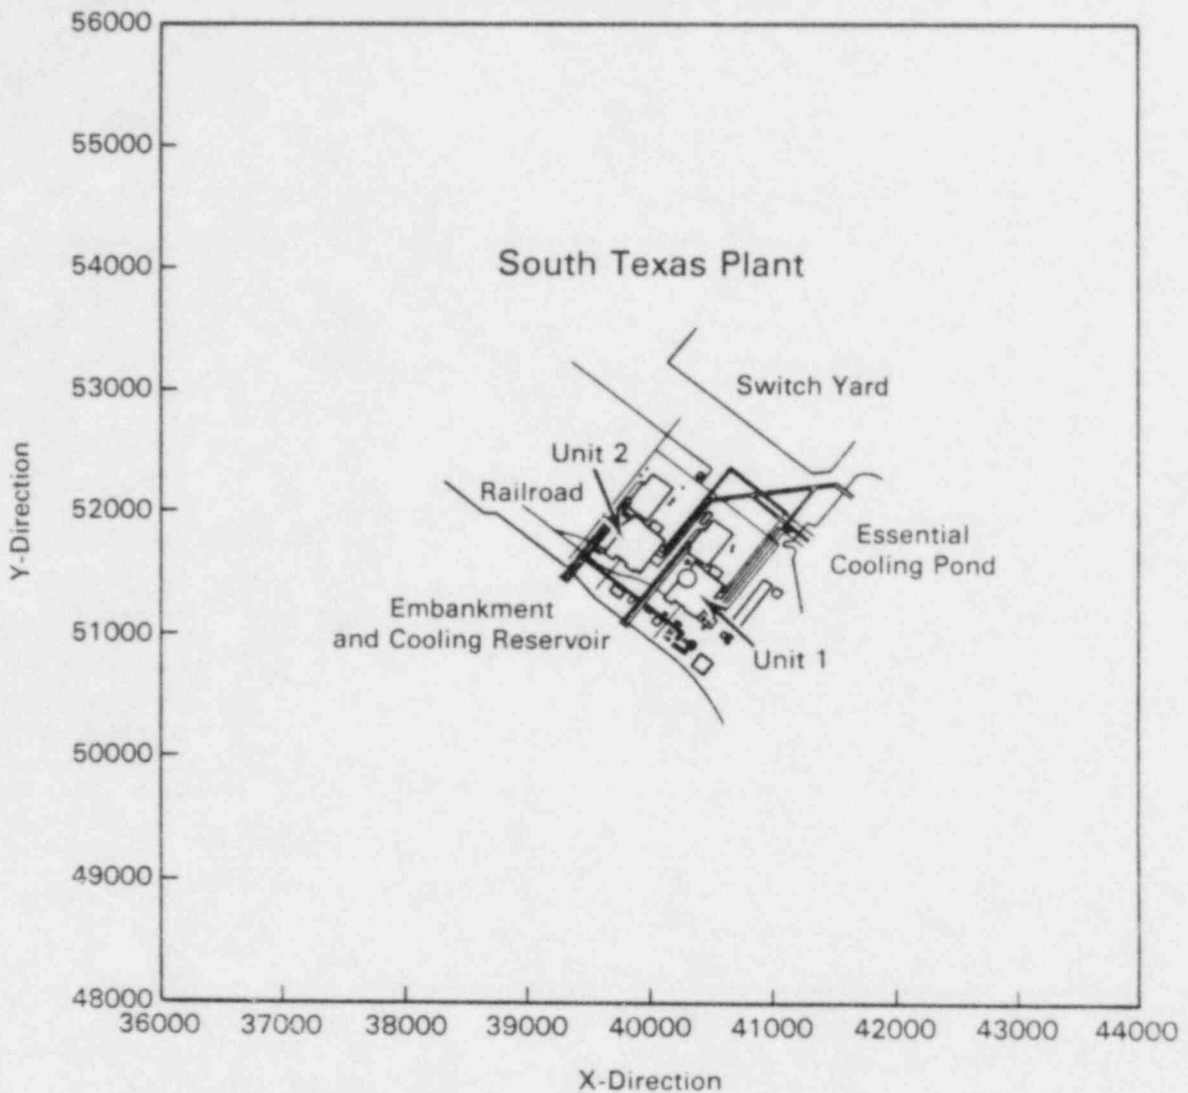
Detailed Plan View of STP Configuration.
